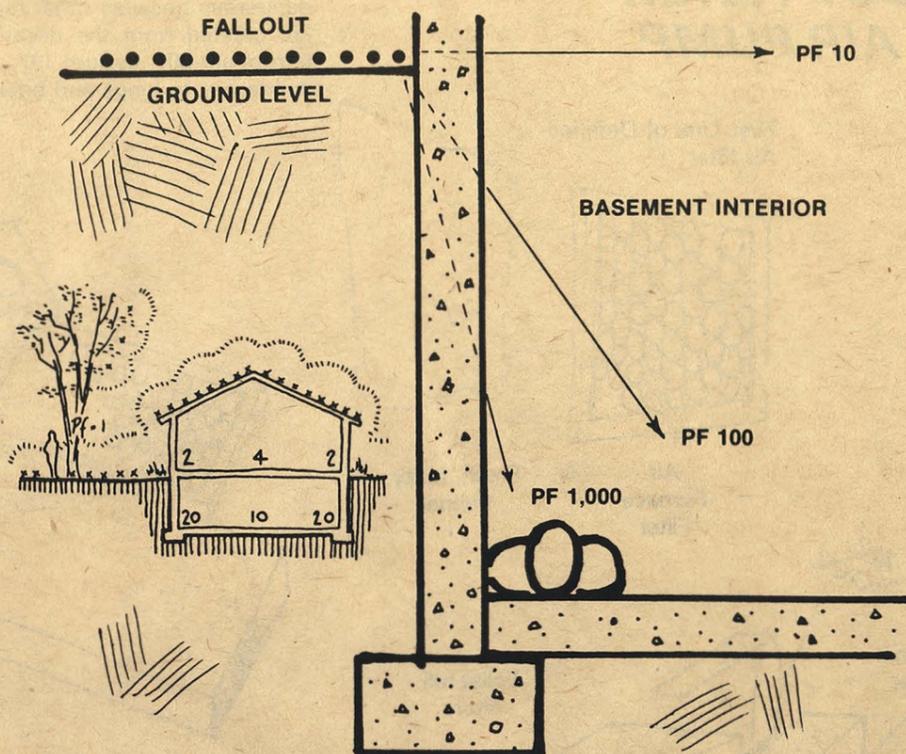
Geometric Shielding in a Basement. The PF provided by a concrete foundation wall increases greatly as the basement floor is approached. Radiation must pass through several feet of earth and concrete to penetrate the wall at such a steep angle. The insert shows
